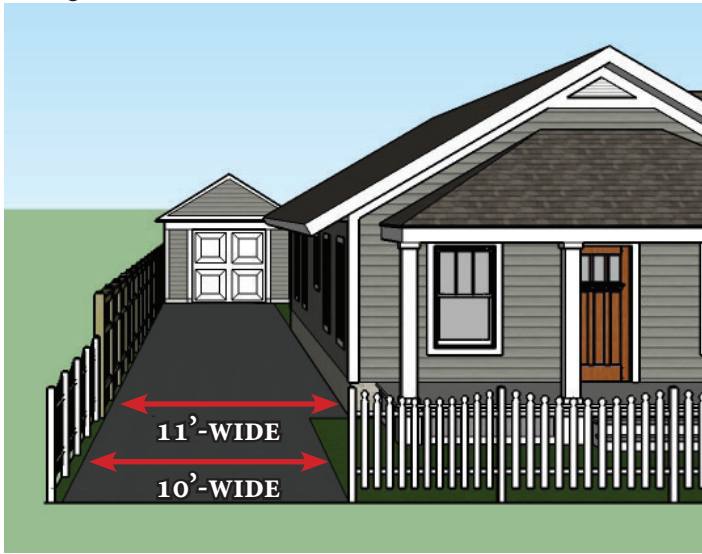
For interior lots, driveways adjacent to the house and accessing garages must be 10'-wide or less from the street to the front of the dwelling and then can expand to 11'-wide or less to be considered under the ACoA process. The driveway may be located on either side of the dwelling. Any driveways directly in-front of the dwelling would require a CoA.
